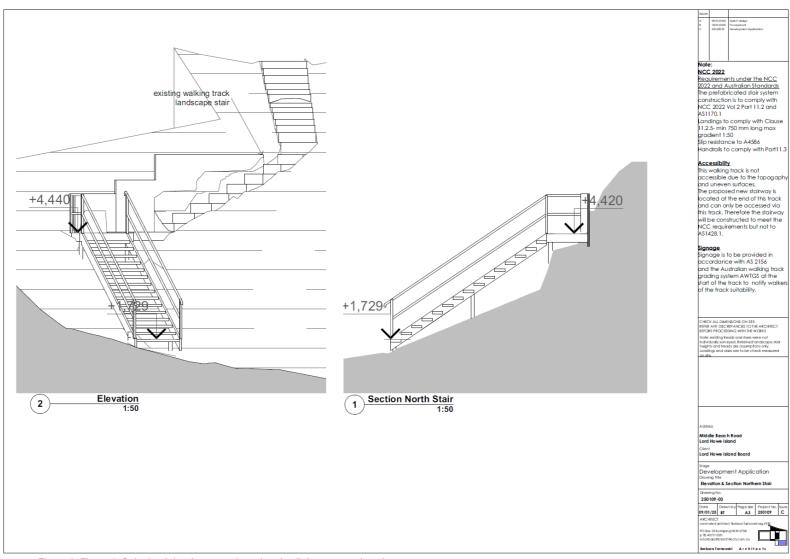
Figure 5: Submitted development plans that detail the proposed works
